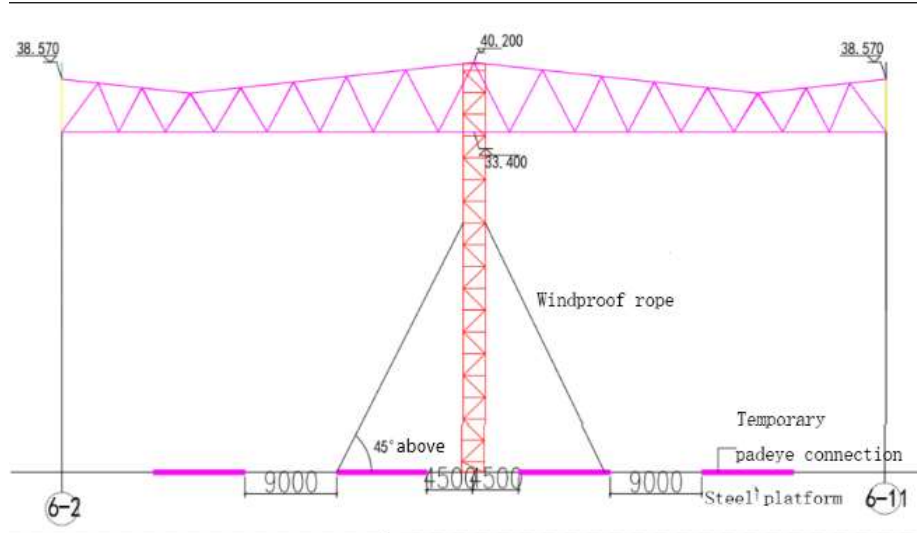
Schematic Diagram of Bracing Column Wind Rope
